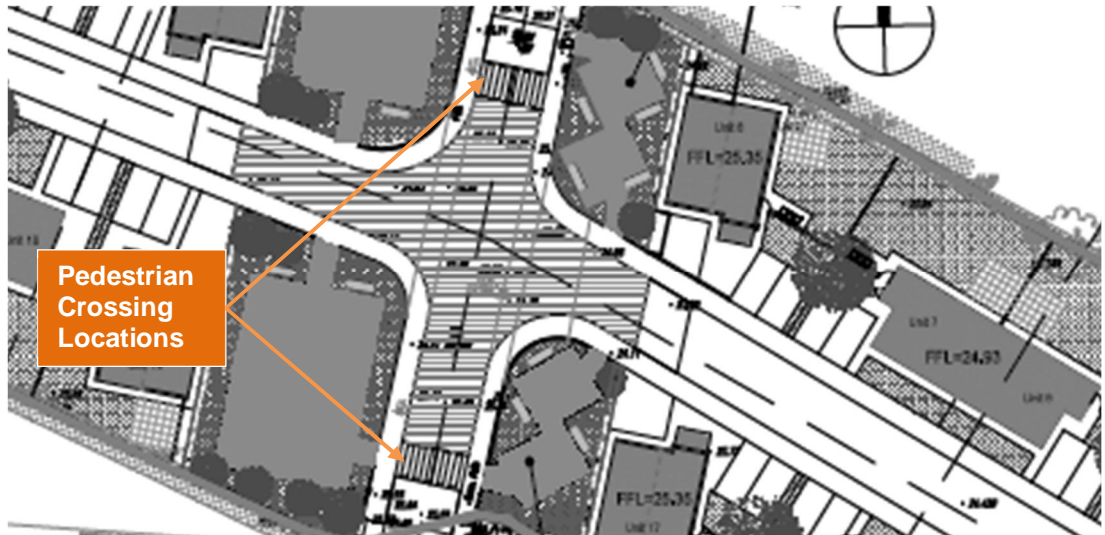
Proposed Site Access & Pedestrian Crossing Locations
